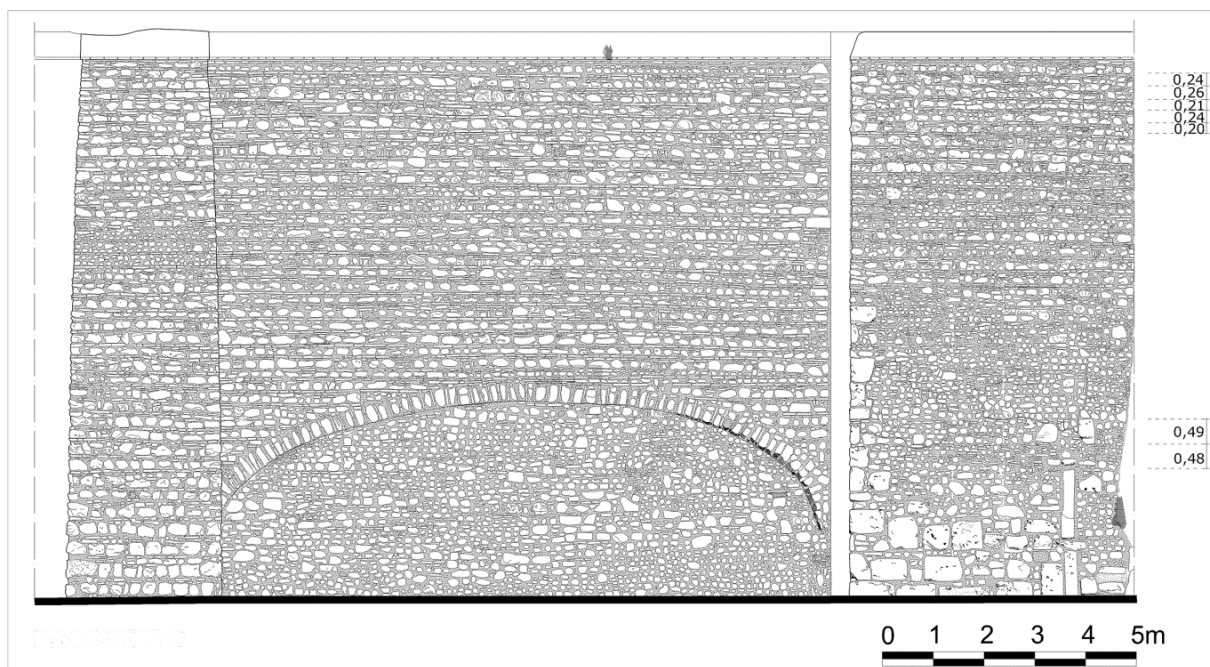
Benevento, urban walls, tower T15, curtain C16 (survey: M.M. Palma).
